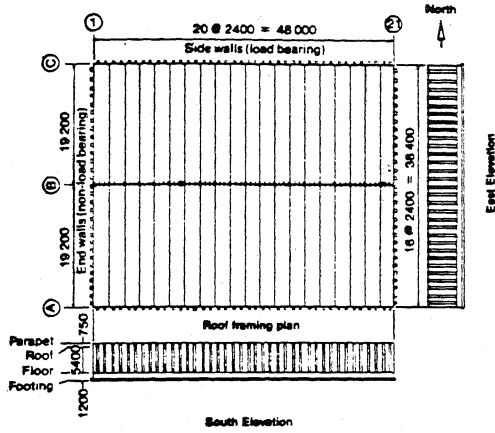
One-storey precast concrete building. Figure 2: Dimensions of Wall and Roof Double Tees.
